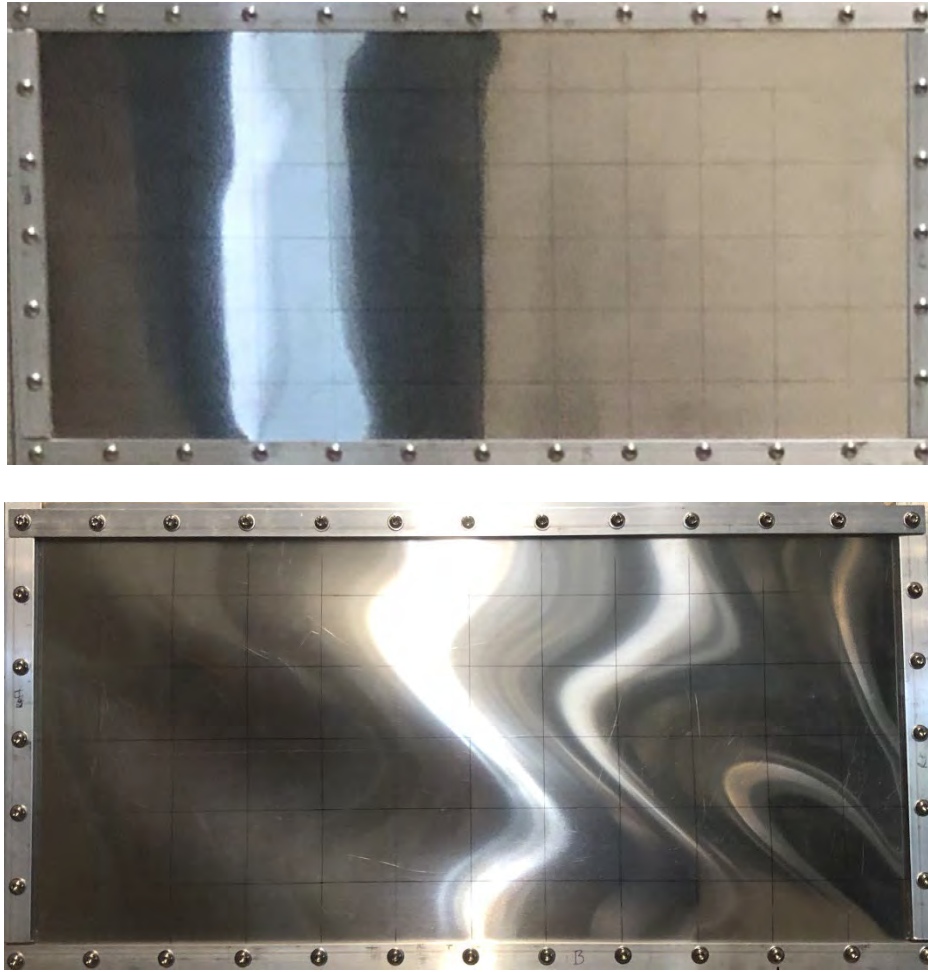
Undeformed plate (top) and deformed plate (bottom)
